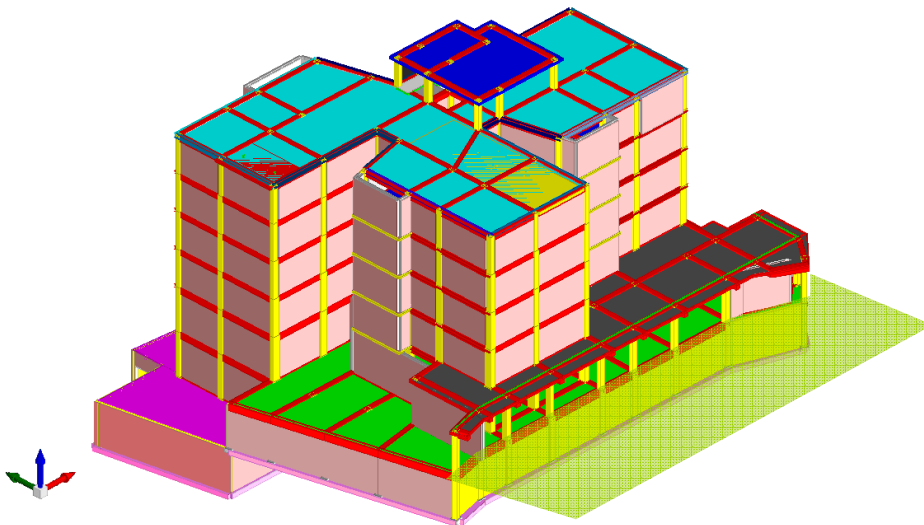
Geometrical model (cantilevered balconies have been disregarded in the modeling).
